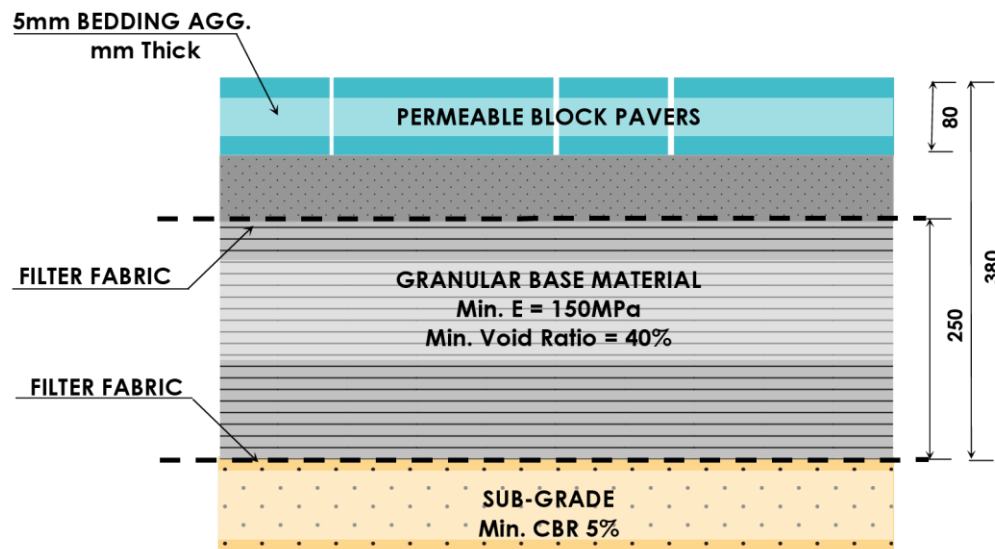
PERMEABLE PAVEMENT DESIGN SECTION
